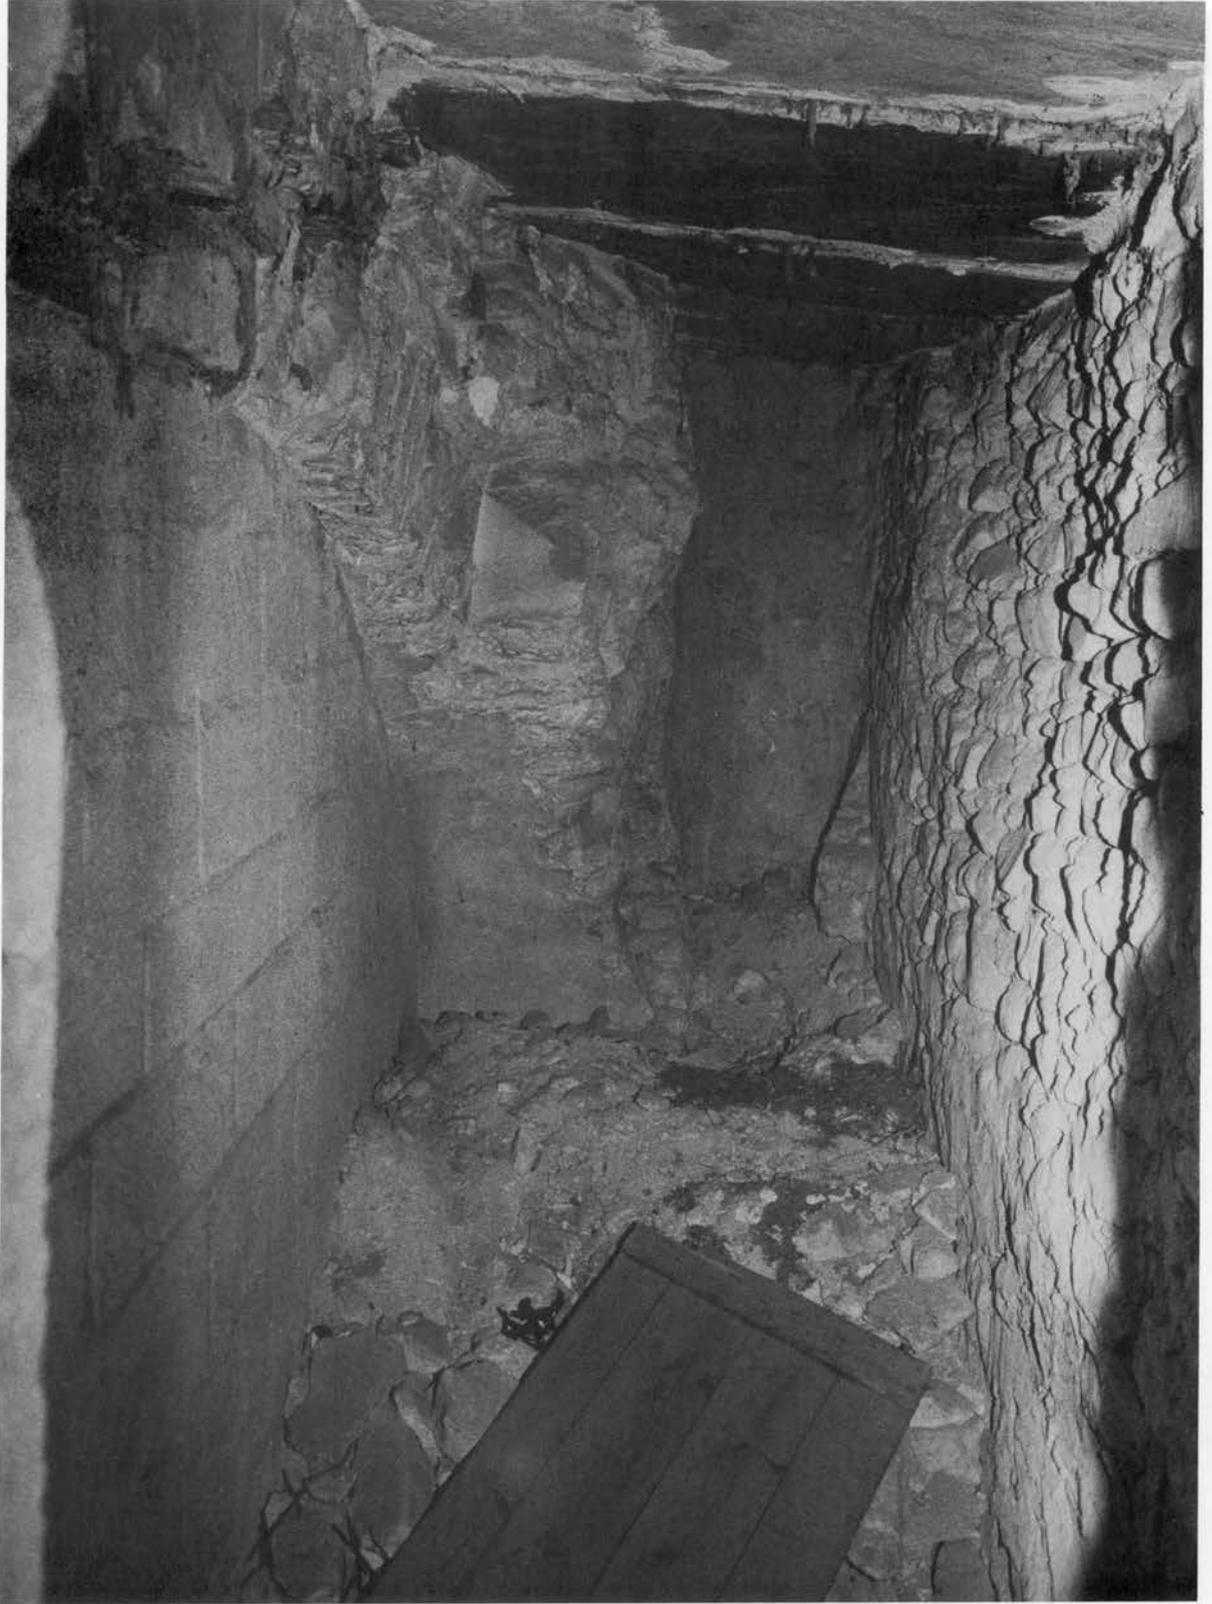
Ely Cathedral. Remains of groin vault against S wall of transept (inside bridge structure).
